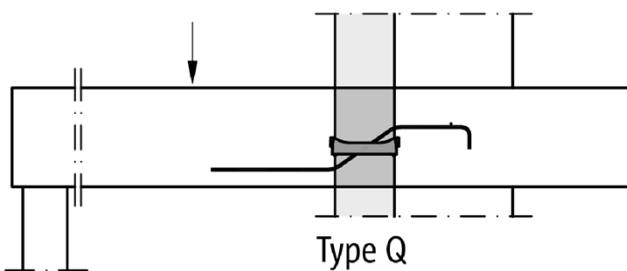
Schöck Isokorb® Type Q for supported balconies, for example shear force bar with bent bar end on the ceiling side (alternatively with straight bar end on the ceiling side);
